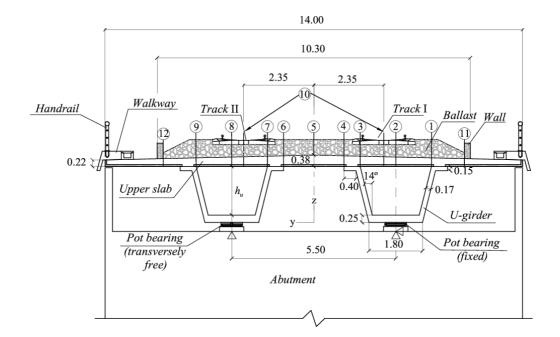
Representative cross-section of a twin-box girder bridge and post-process points
